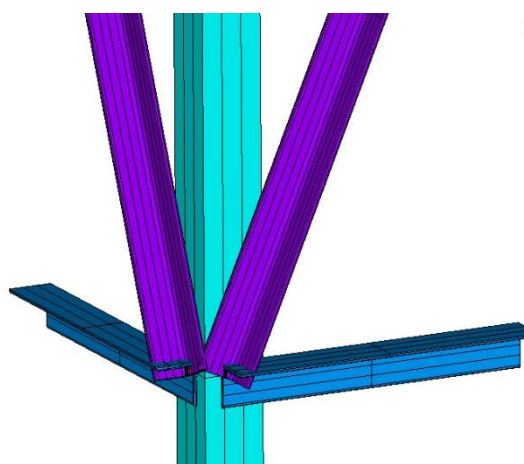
Tower model Level II approach – Detail of connection between vertical bracing and leg
